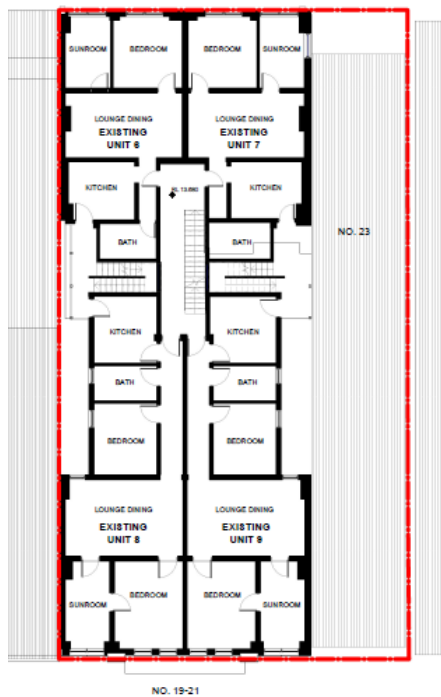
Existing Second Floor Plan. (Source: NBRSEARCHITECTURE)
